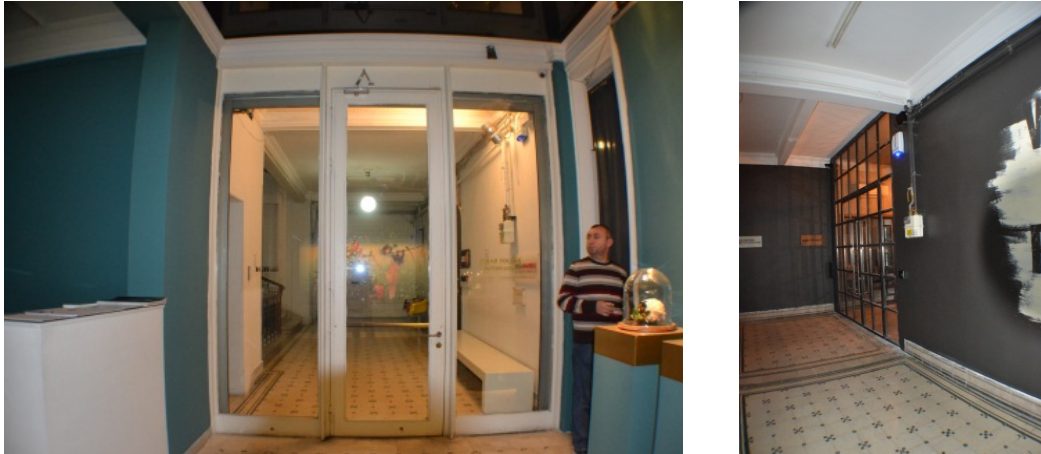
Interventions in the circulation spaces of Mısır Apartment Building, 2016.
